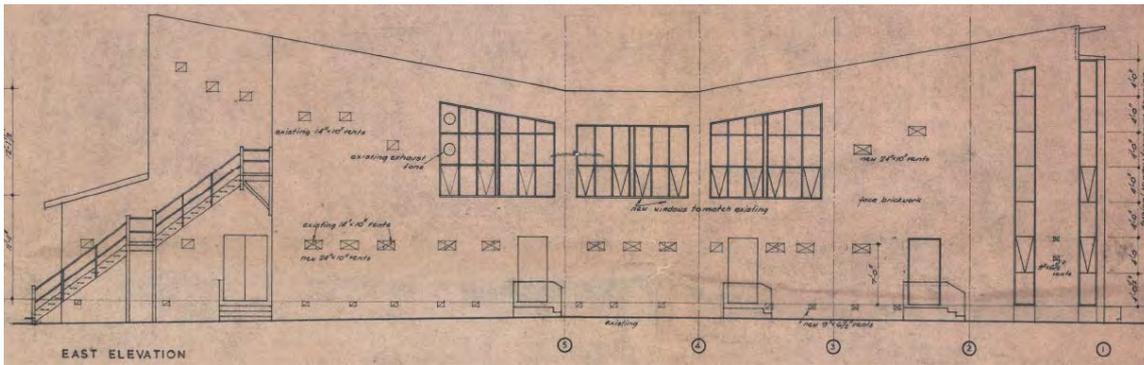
Drawing related to building permit 4609. Proposed east elevation (K Popper, Nov. 1972) (Source: Council Building File)
